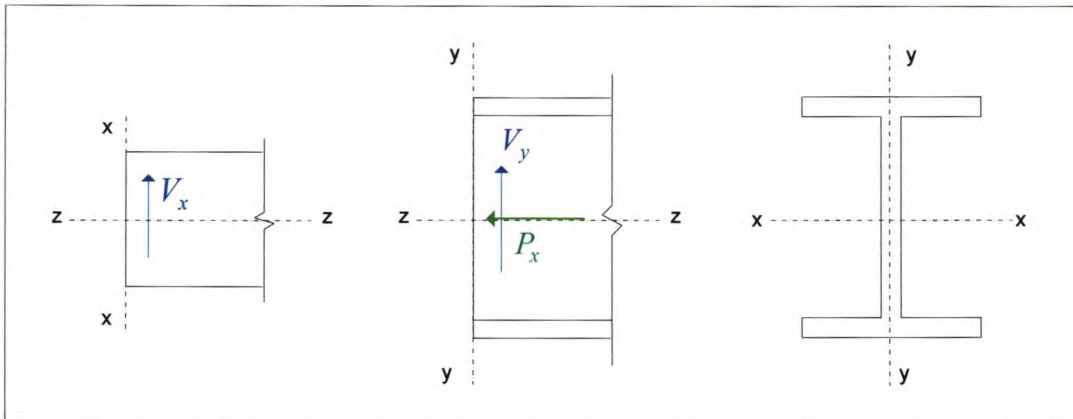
Axis Definition for Beam Column Shear Connections
